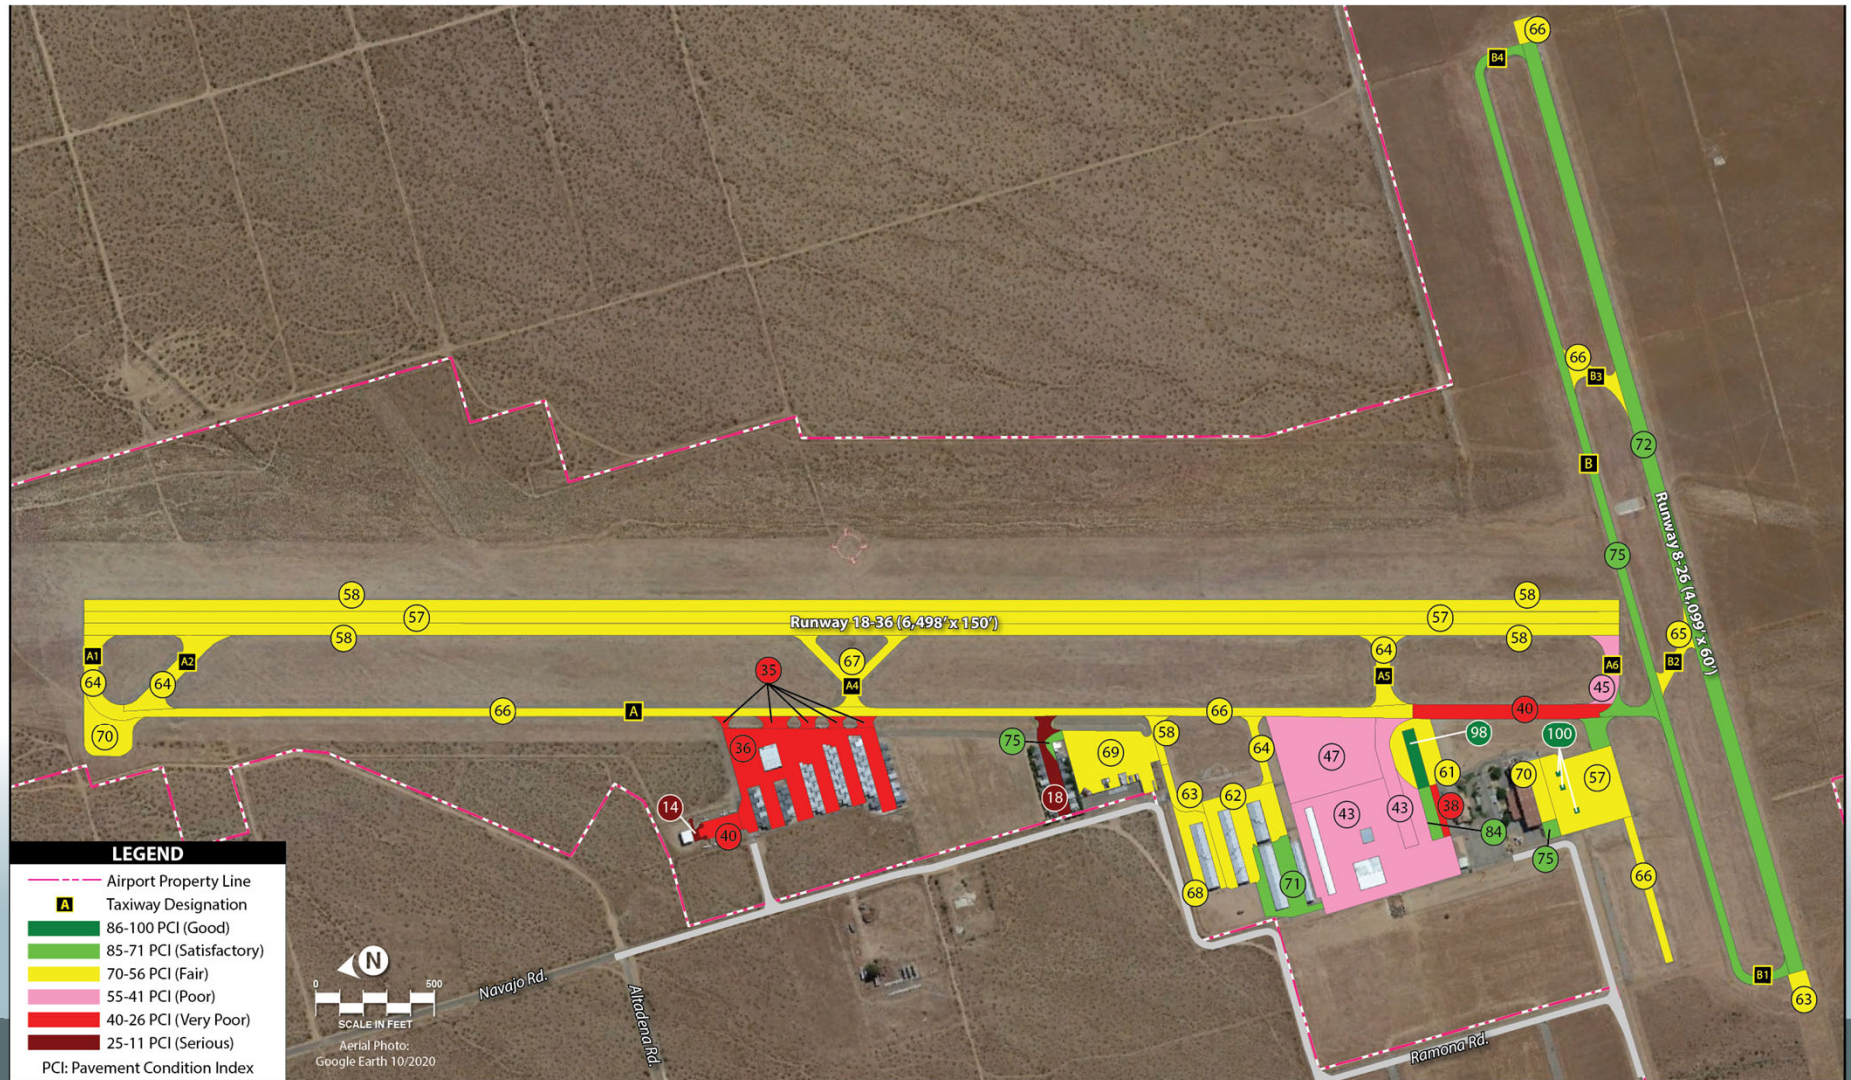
E – Pavement Conditions (2022 Inspection)
